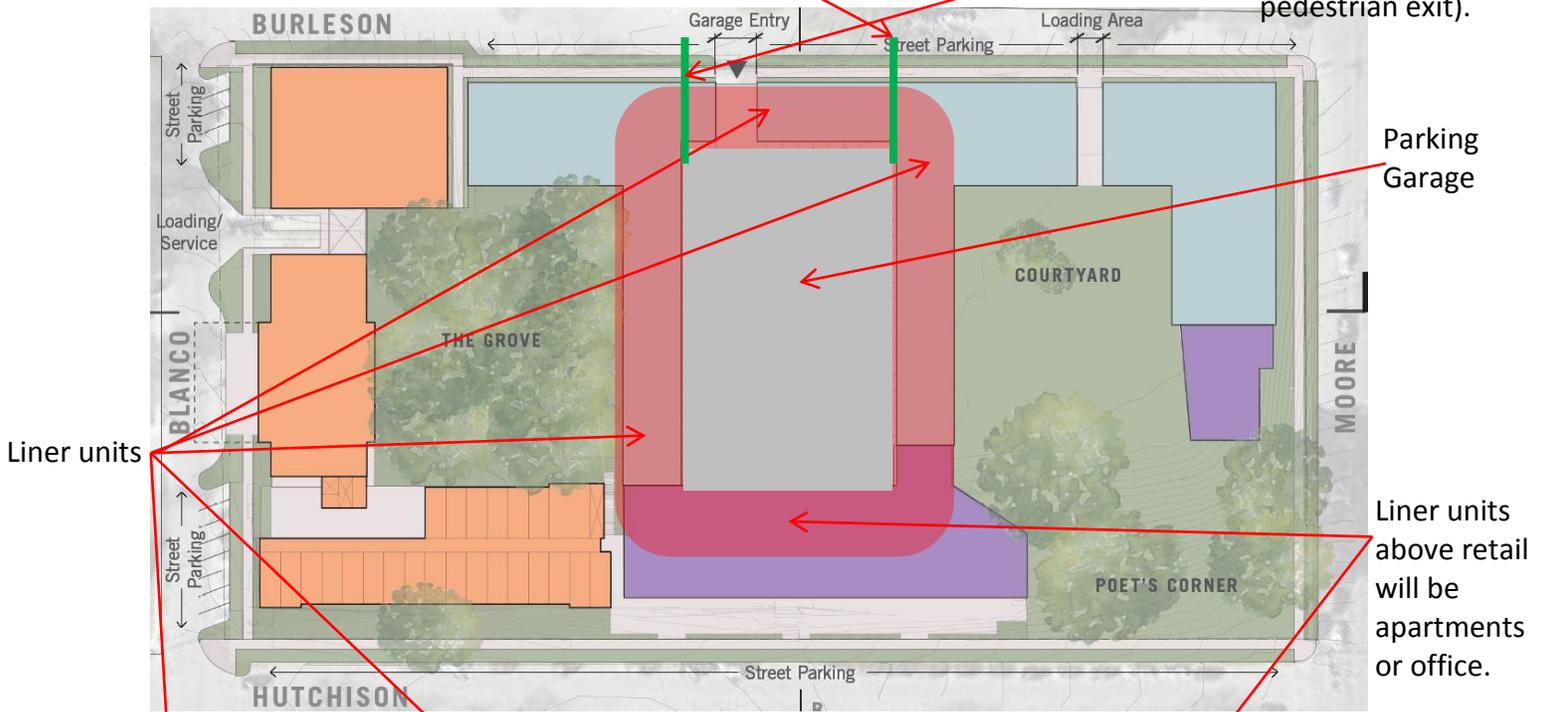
Location of parking garage is depicted in gray. Liner units surrounding garage are depicted in the red ringed area and include units above the retail space.
